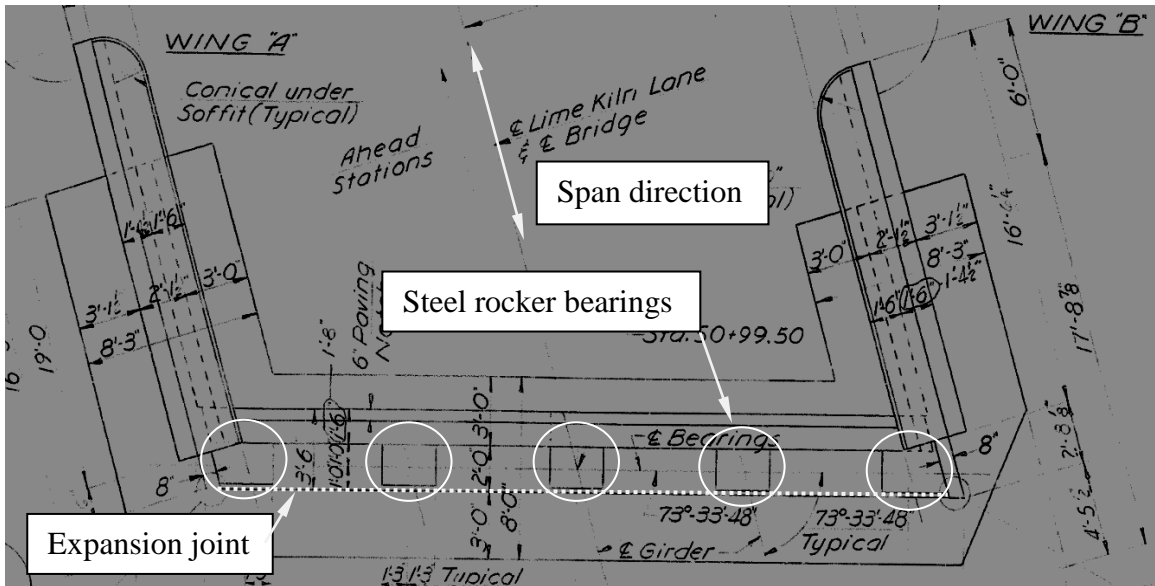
Plan view of east end abutment (excerpted from structural drawings).
